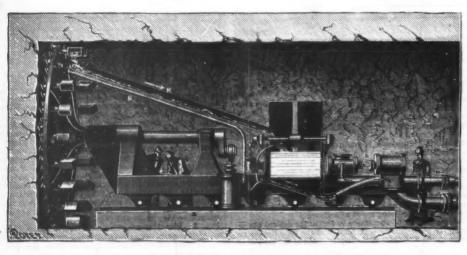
CRAMPTON'S HYDRAULIC TUNNELING MACHINE.
